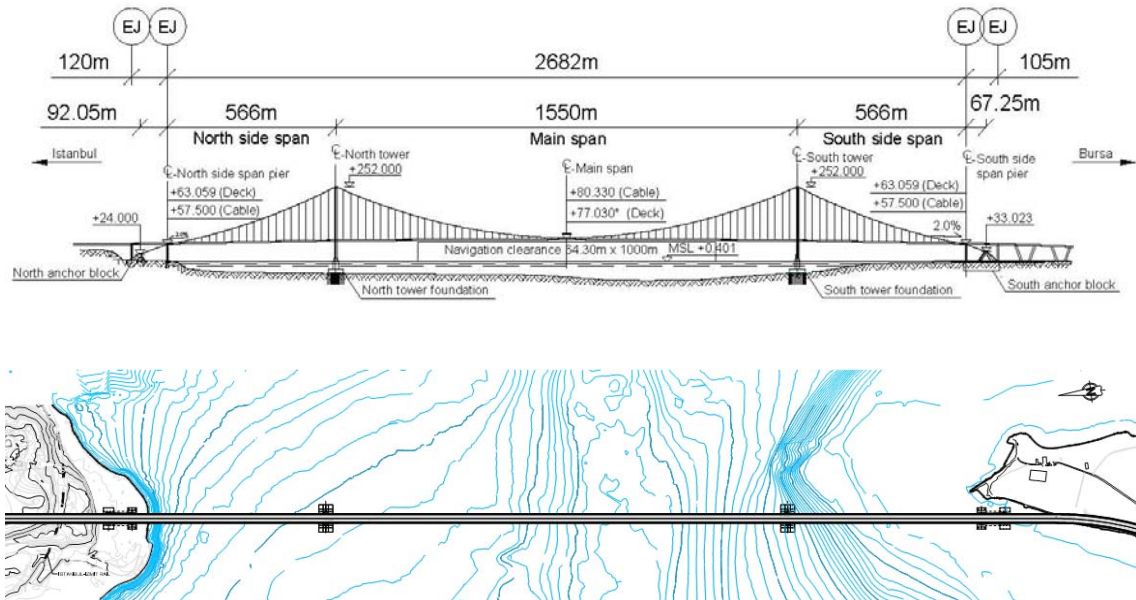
Izmit Bay Crossing Suspension Bridge
